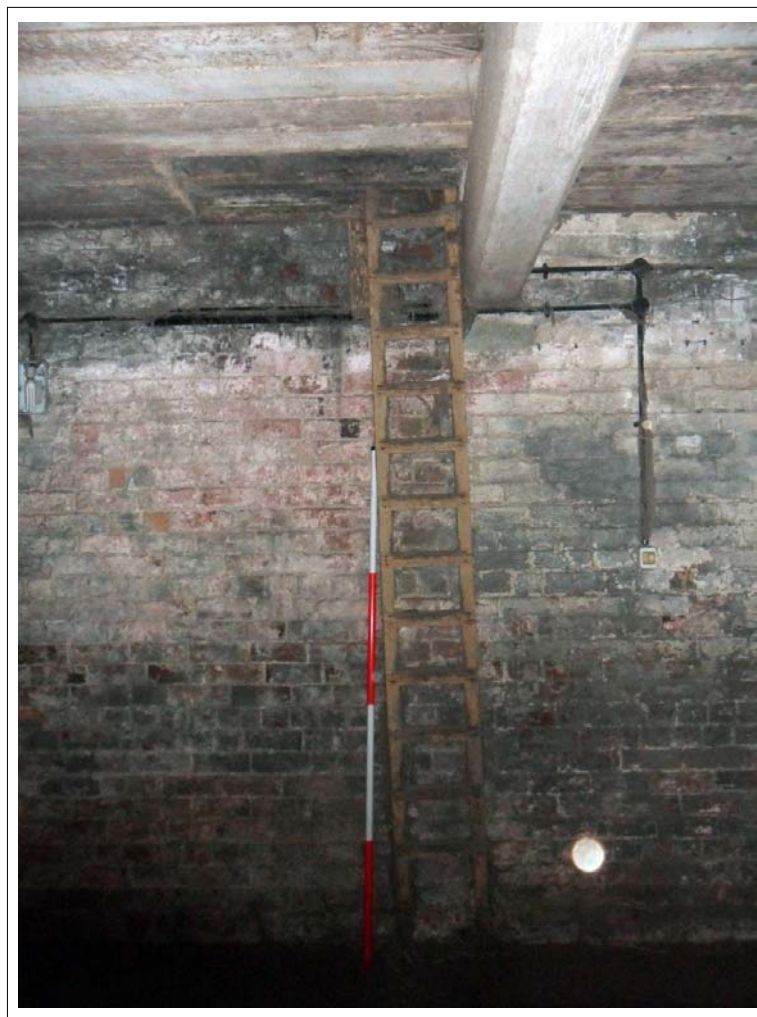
Ladder between ground and first floor, located against wall within corridor for quick access between levels
